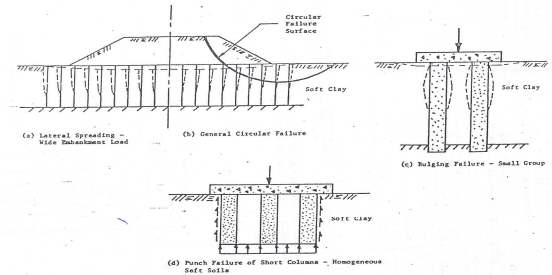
FAILURE MODES OF STONE COLUMN GROUPS.
